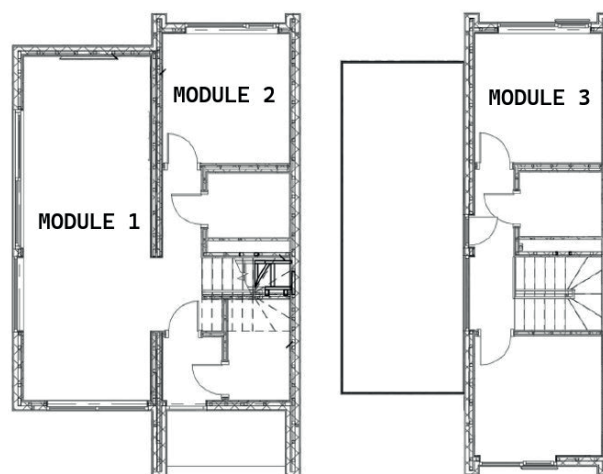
Floor plan of the modular building-ground floor and first floor-including the assigned module numbers
